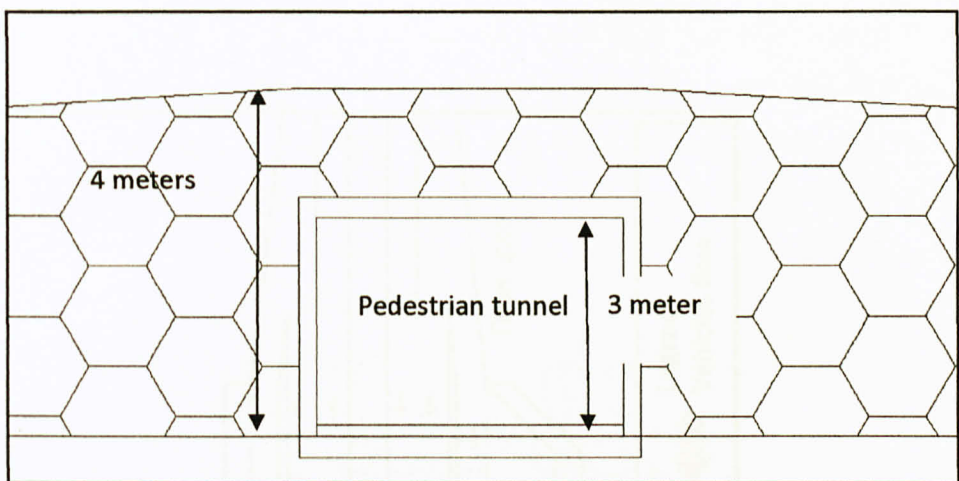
Pedestrian tunnel height and embankment height for type 1 crossing
